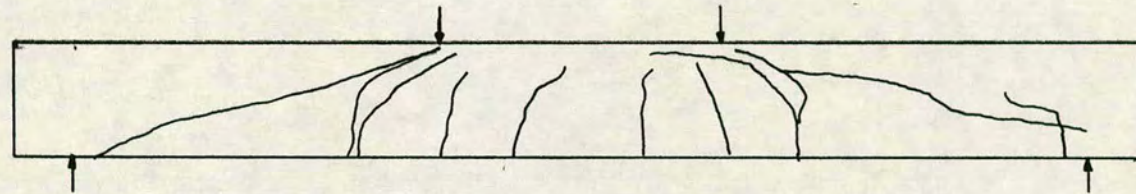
Flexure-Shear Crack in a Partially Prestressed Concrete Beam
